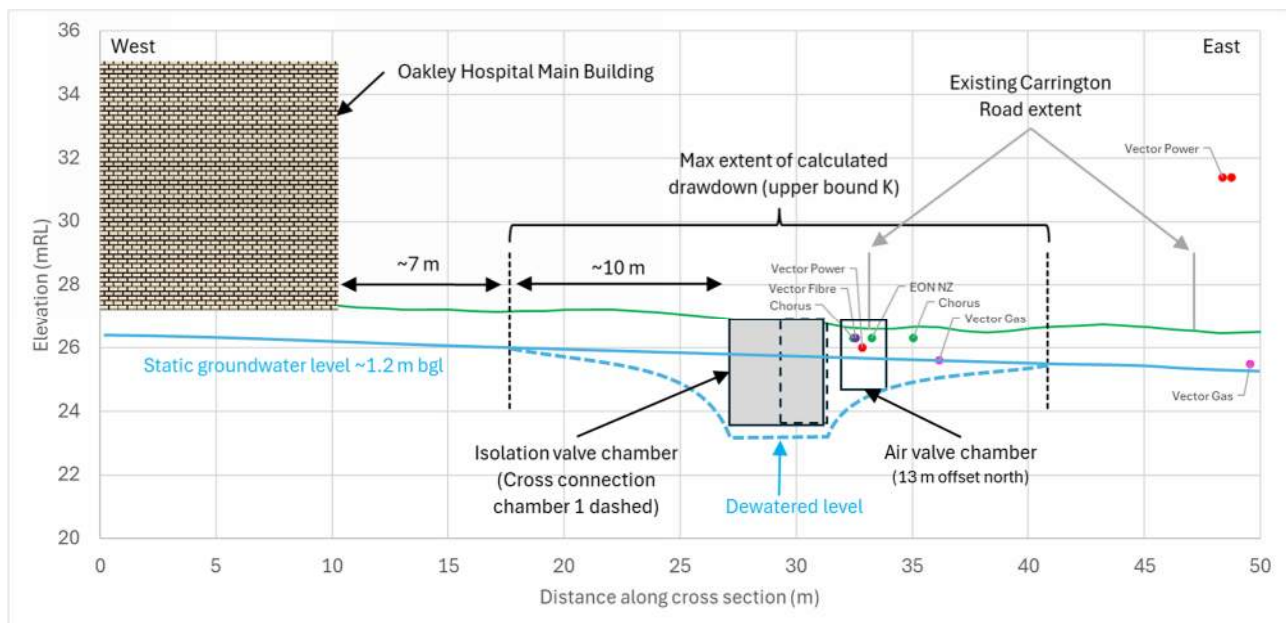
Cross section through Isolation valve chamber excavation perpendicular to Carrington Road alignment showing maximum calculated extent of drawdown in relation to existing services.
